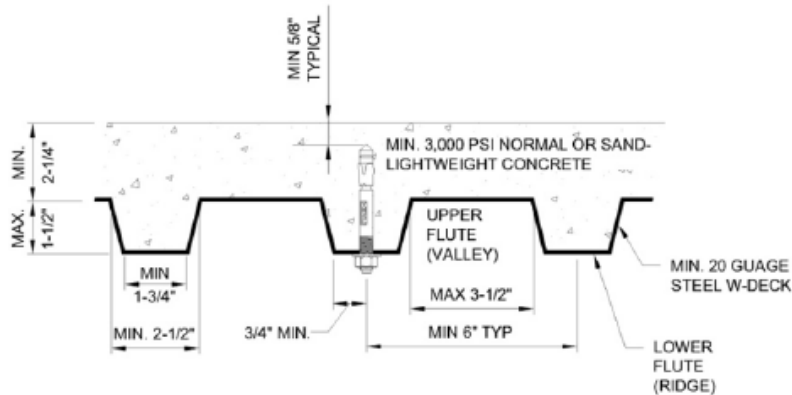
B—INSTALLATION IN THE SOFFIT OF CONCRETE OVER METAL DECK FLOOR AND ROOF ASSEMBLIES – B DECK^{1,2}
